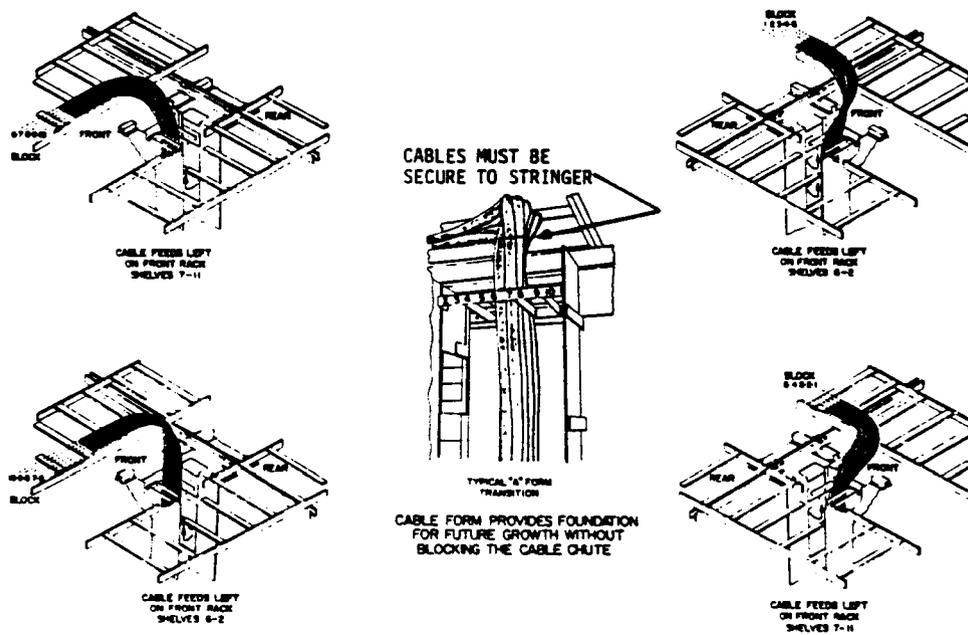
TYPICAL (OP) CABLE ARRANGEMENT
